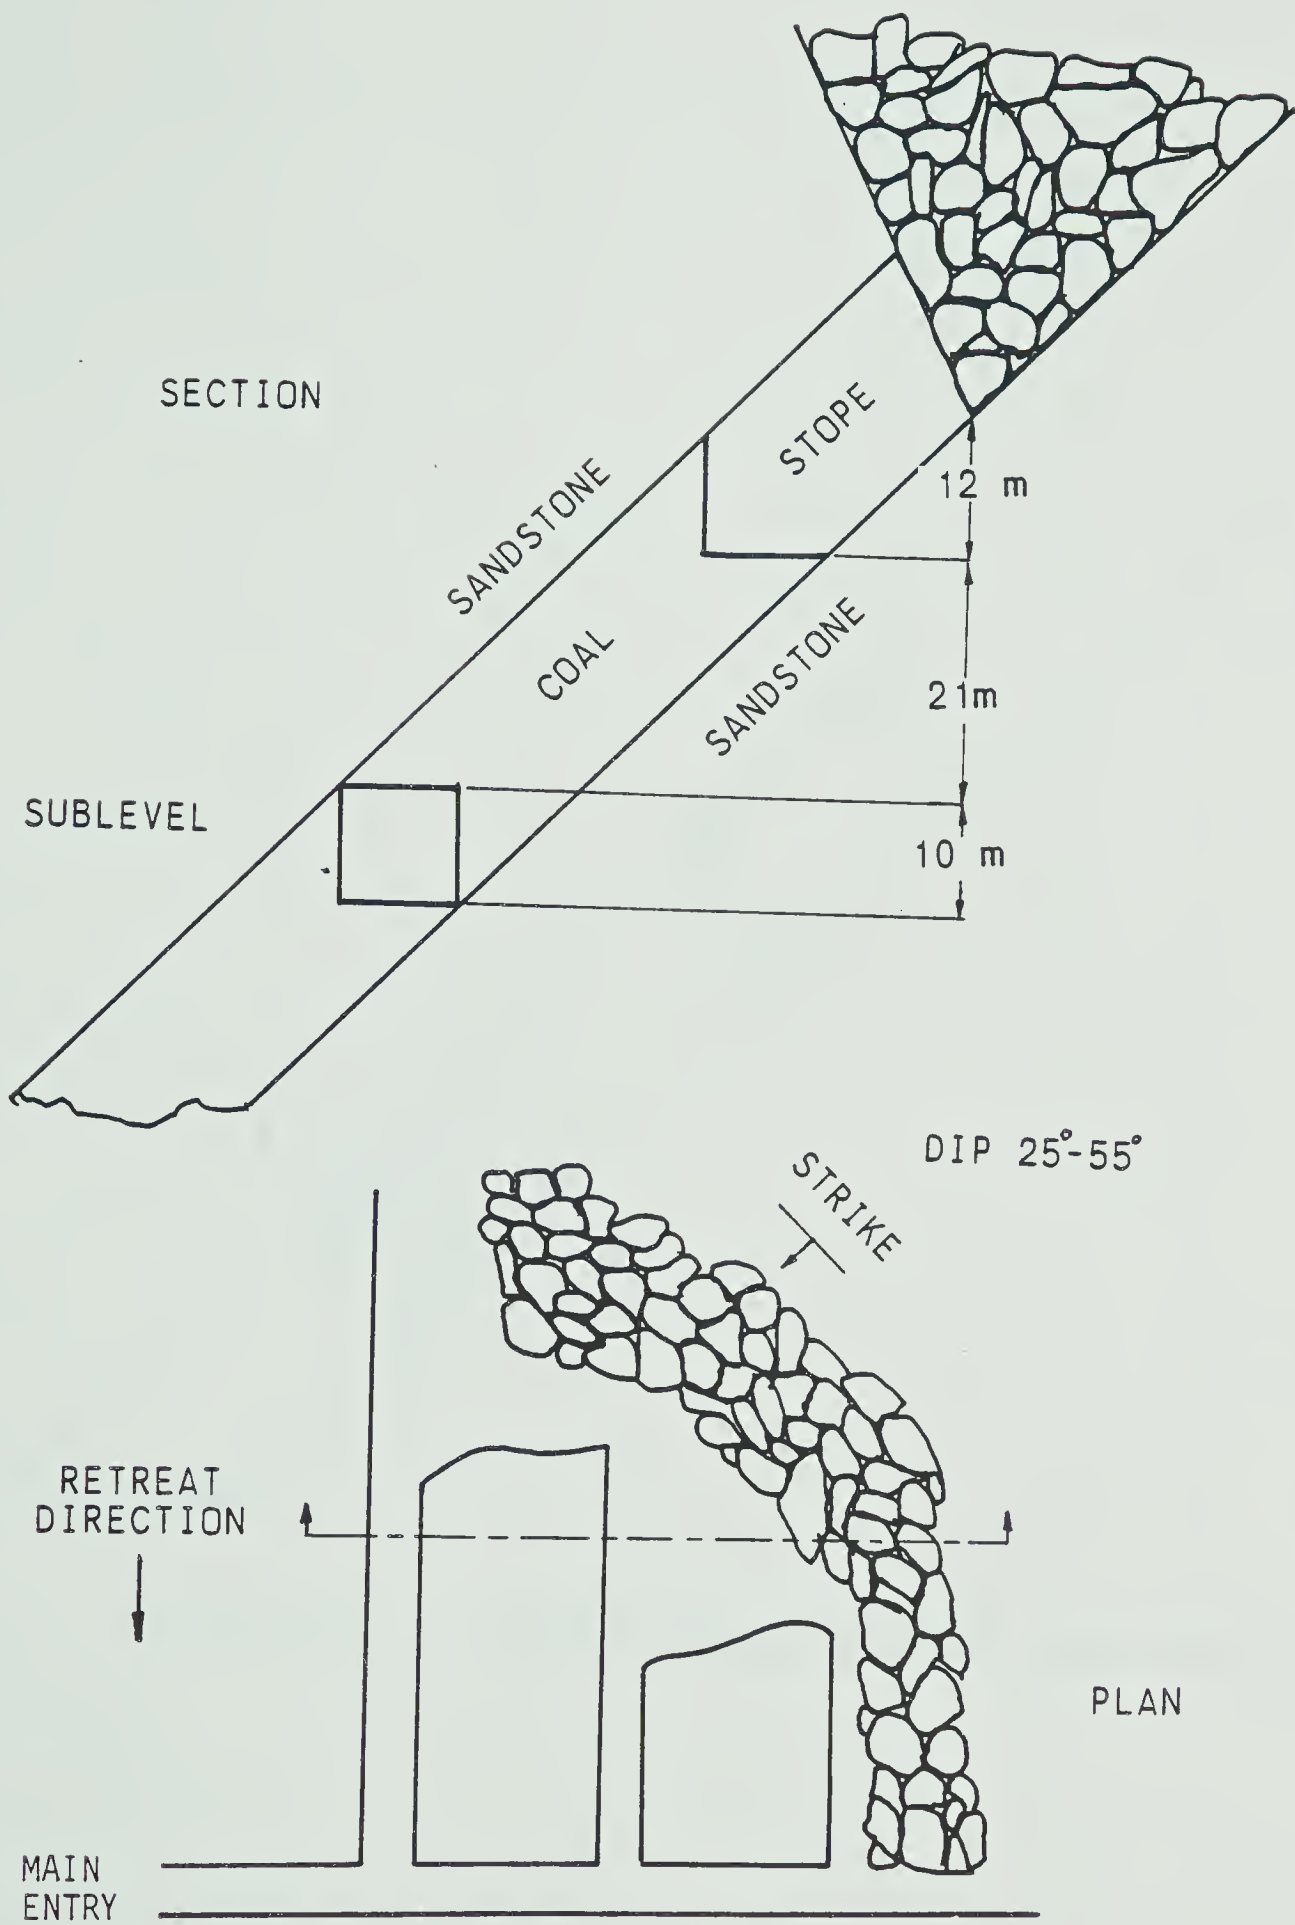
PLAN AND SECTION OF CONFIGURATION 2
